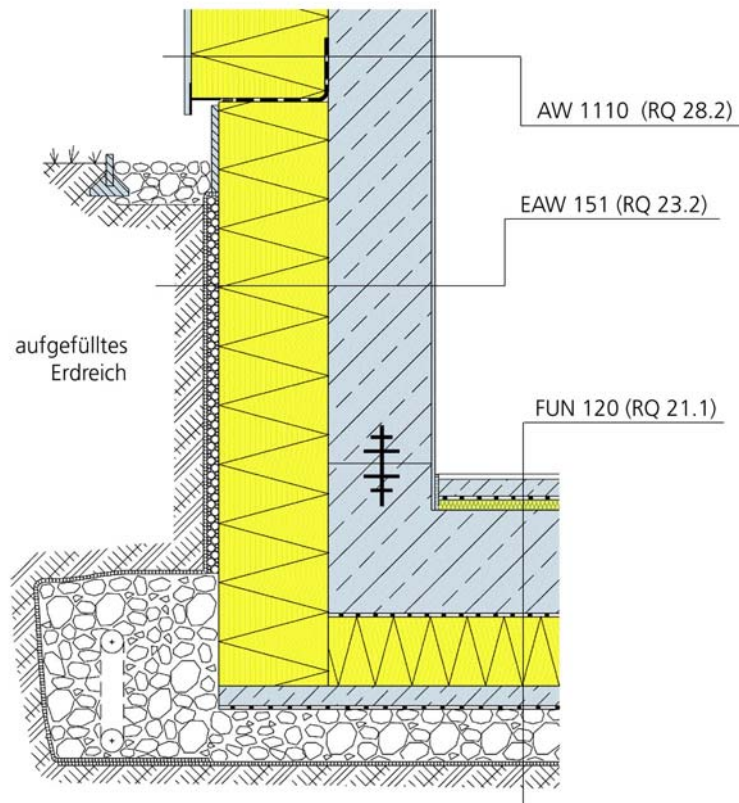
Connection detail. Foundation slab without continuous footing, connected to an external wall (below ground level).
